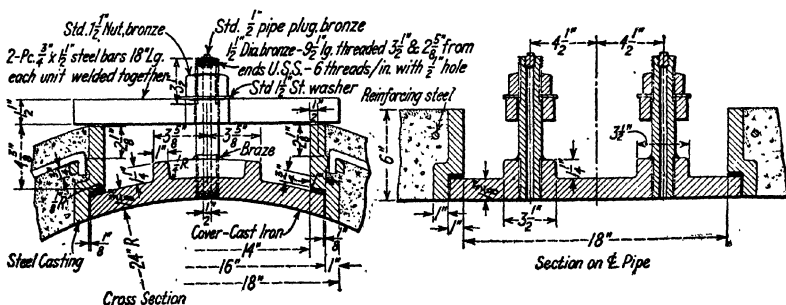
14" x 18" Manhole for 48-in. Reinforced Concrete Pipe. Lock Joint Pipe Co.
